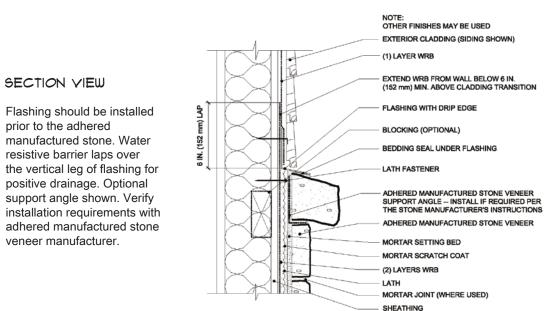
FOUNDATION WALL-TRANSITION TO AMSY CONTINUING DOWN FOUNDATION
